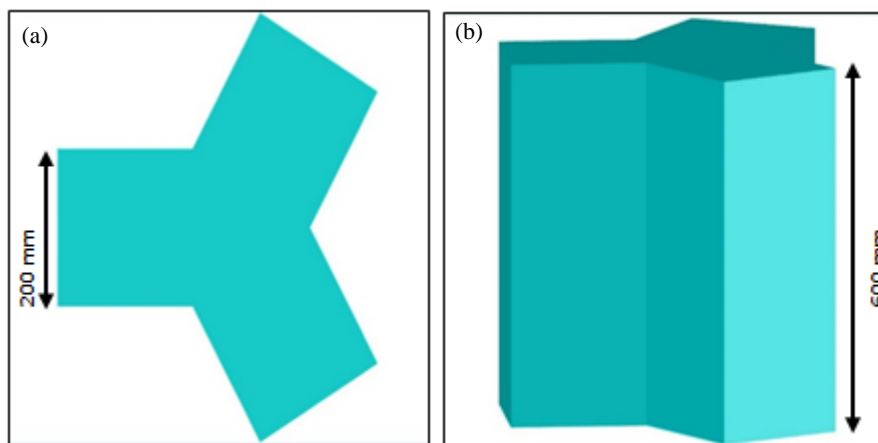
Detailed Dimensions of the model A sharp corners (a) Plan of Y shaped tall building and (b) Isometric view
